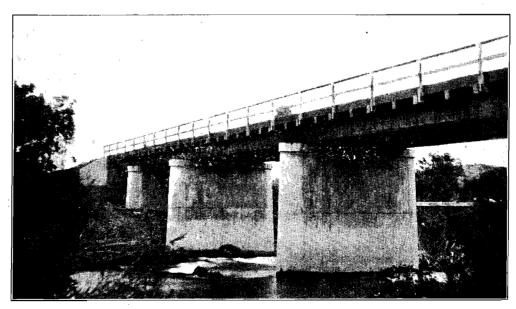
A.—New bridge (Devlin's) on the Glenburn Road.
